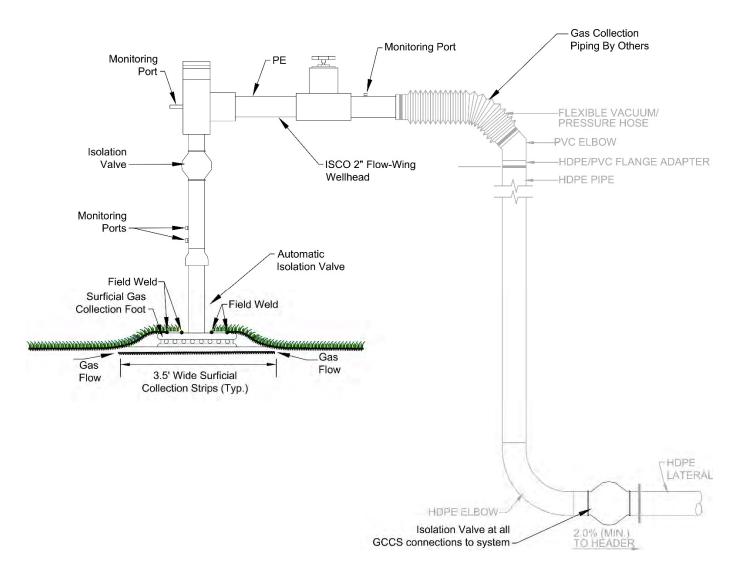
ClosureTurf® Surficial Collection Foot Connection to GCCS System
